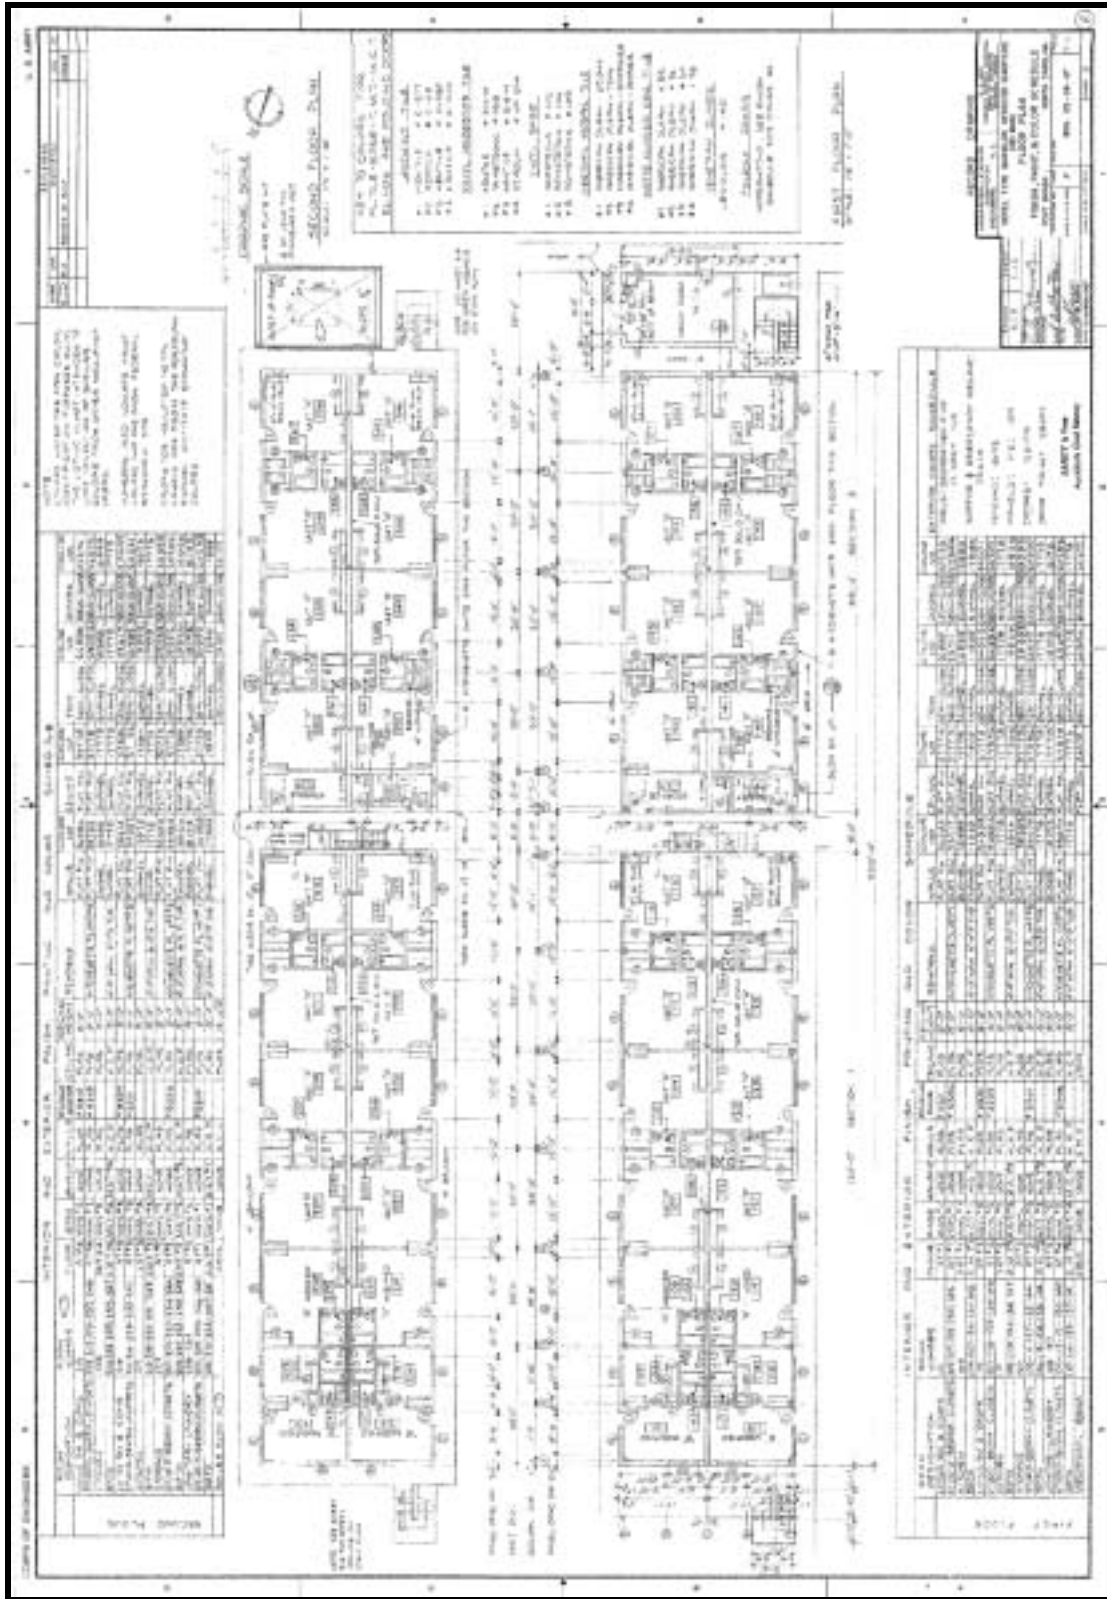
120-man motel type BOQ, floor plan, Ft. Bragg (1967, revised 1969) (Engineering, Ft. Bragg).
